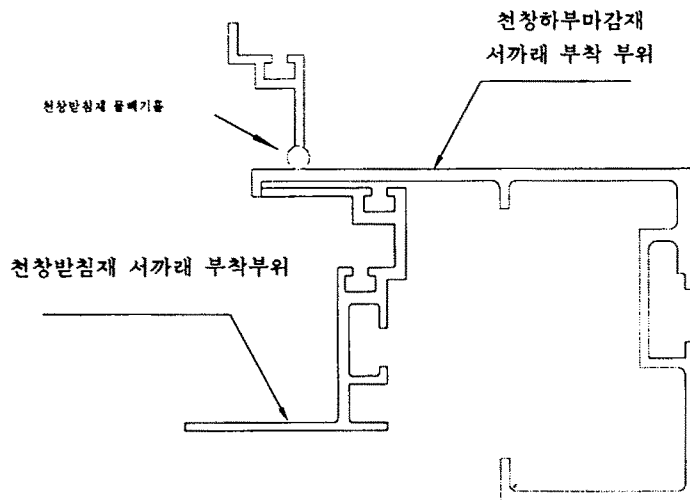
Watershoot setting drawing of bottom finishing member of top light
